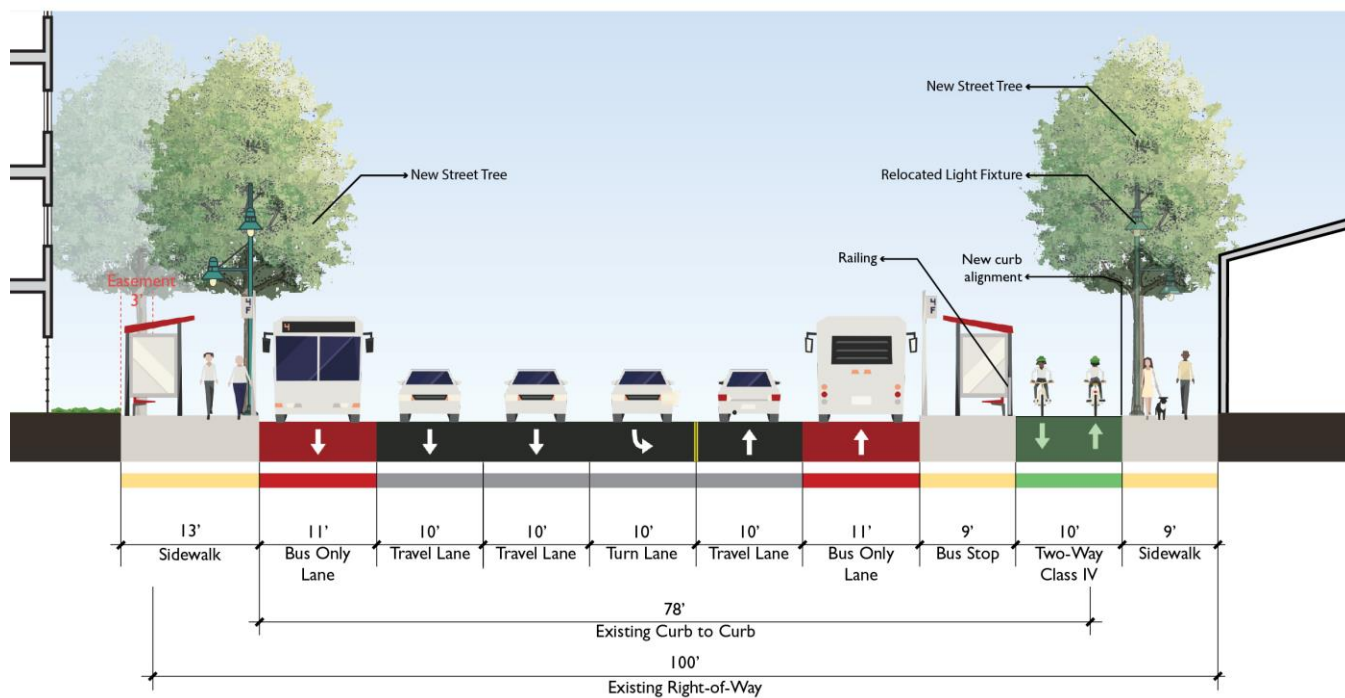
40th Street at bus stops located at Emery Street (looking west) – SECTION E
